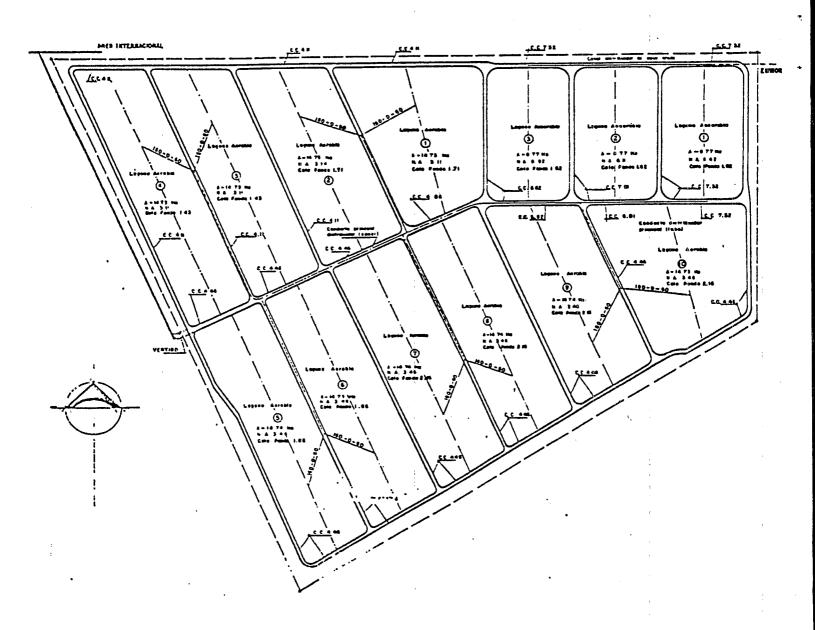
PLAN VIEW OF MEXICALI, MEXICO WASTEWATER STABILIZATION POND SYSTEM (MEXICALI I)
